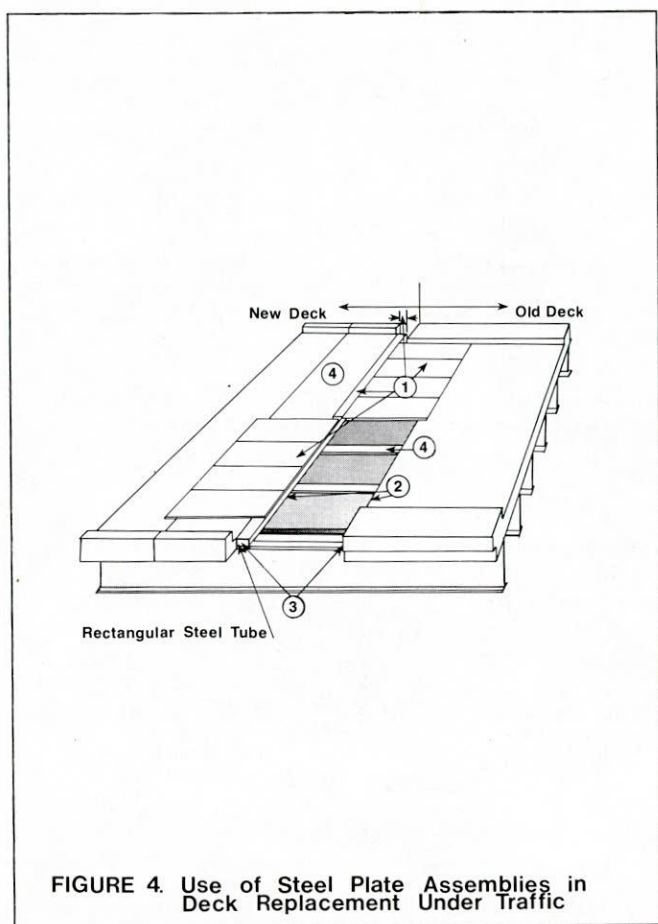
Use of Steel Plate Assemblies in Deck Replacement Under Traffic
